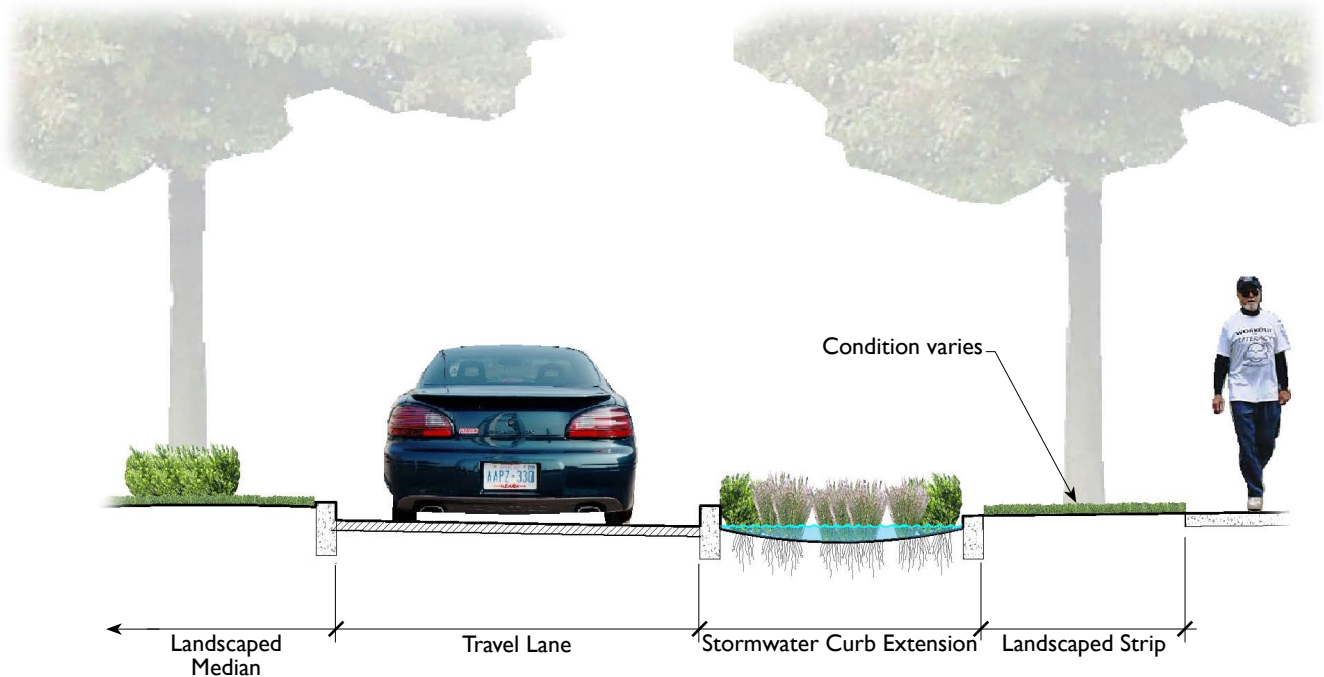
RETROFIT OPPORTUNITY: The same residential street retrofitted with stormwater curb extensions and a conventional landscape median with street trees.
